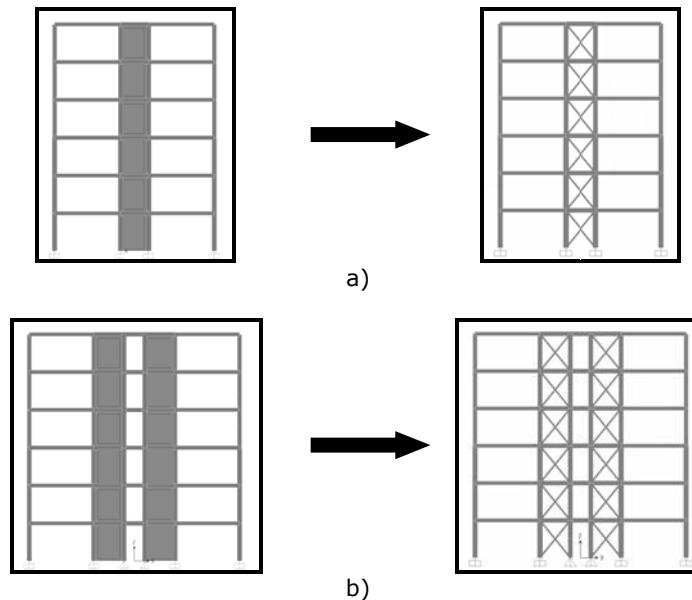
Vertical truss with diagonals: single system; system with coupling beams
